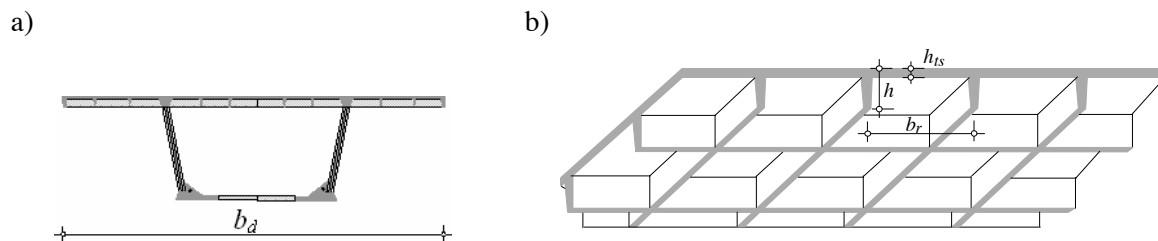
UHPFRC in bridge superstructure: a) ribbed-deck slab in complete bridge superstructure; b) zoom on ribbed slab and characteristic geometrical parameters
